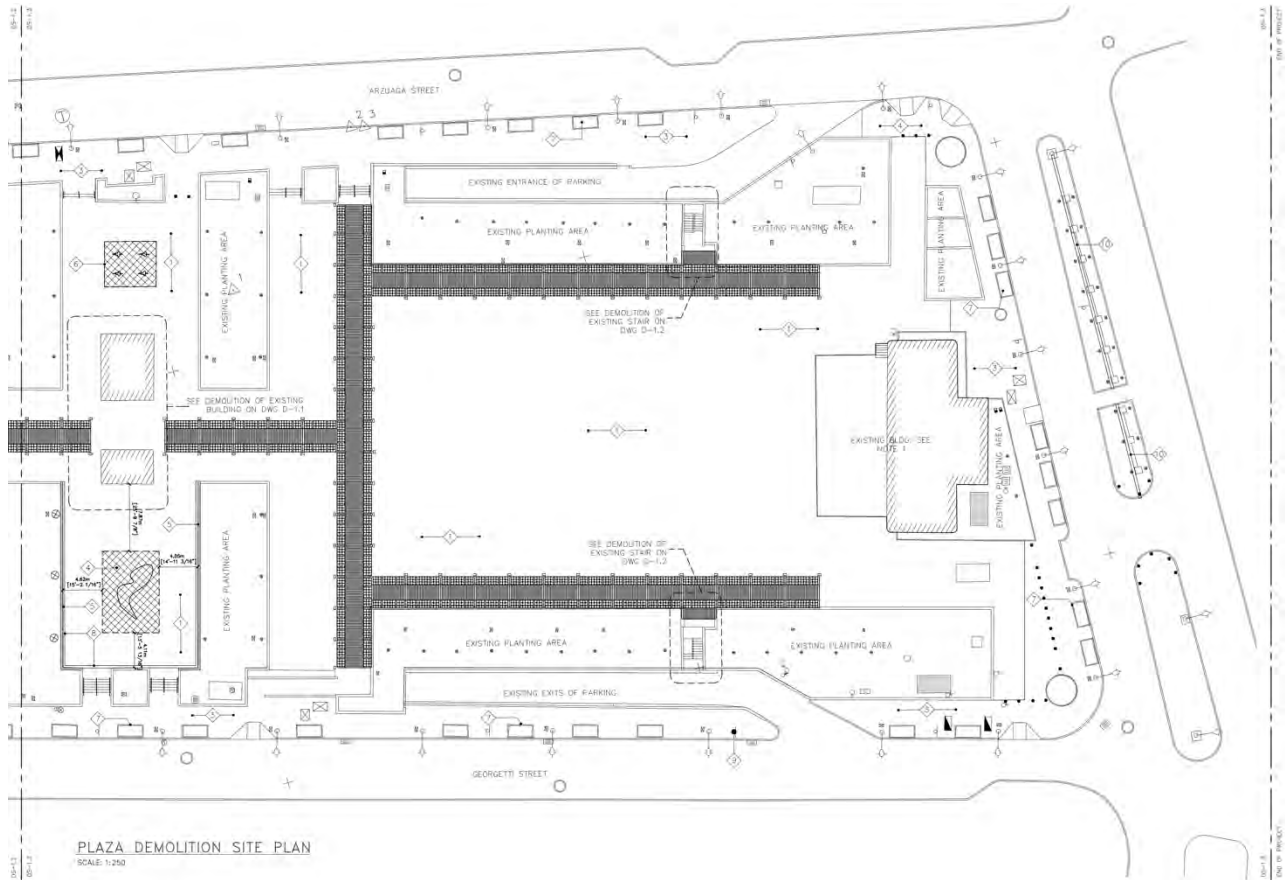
Demolition site plan for the east half of Plaza de la Convalecencia (Source: Drawing DS-1.3, Hernández-Bauzá PSC Architects, 2024).
